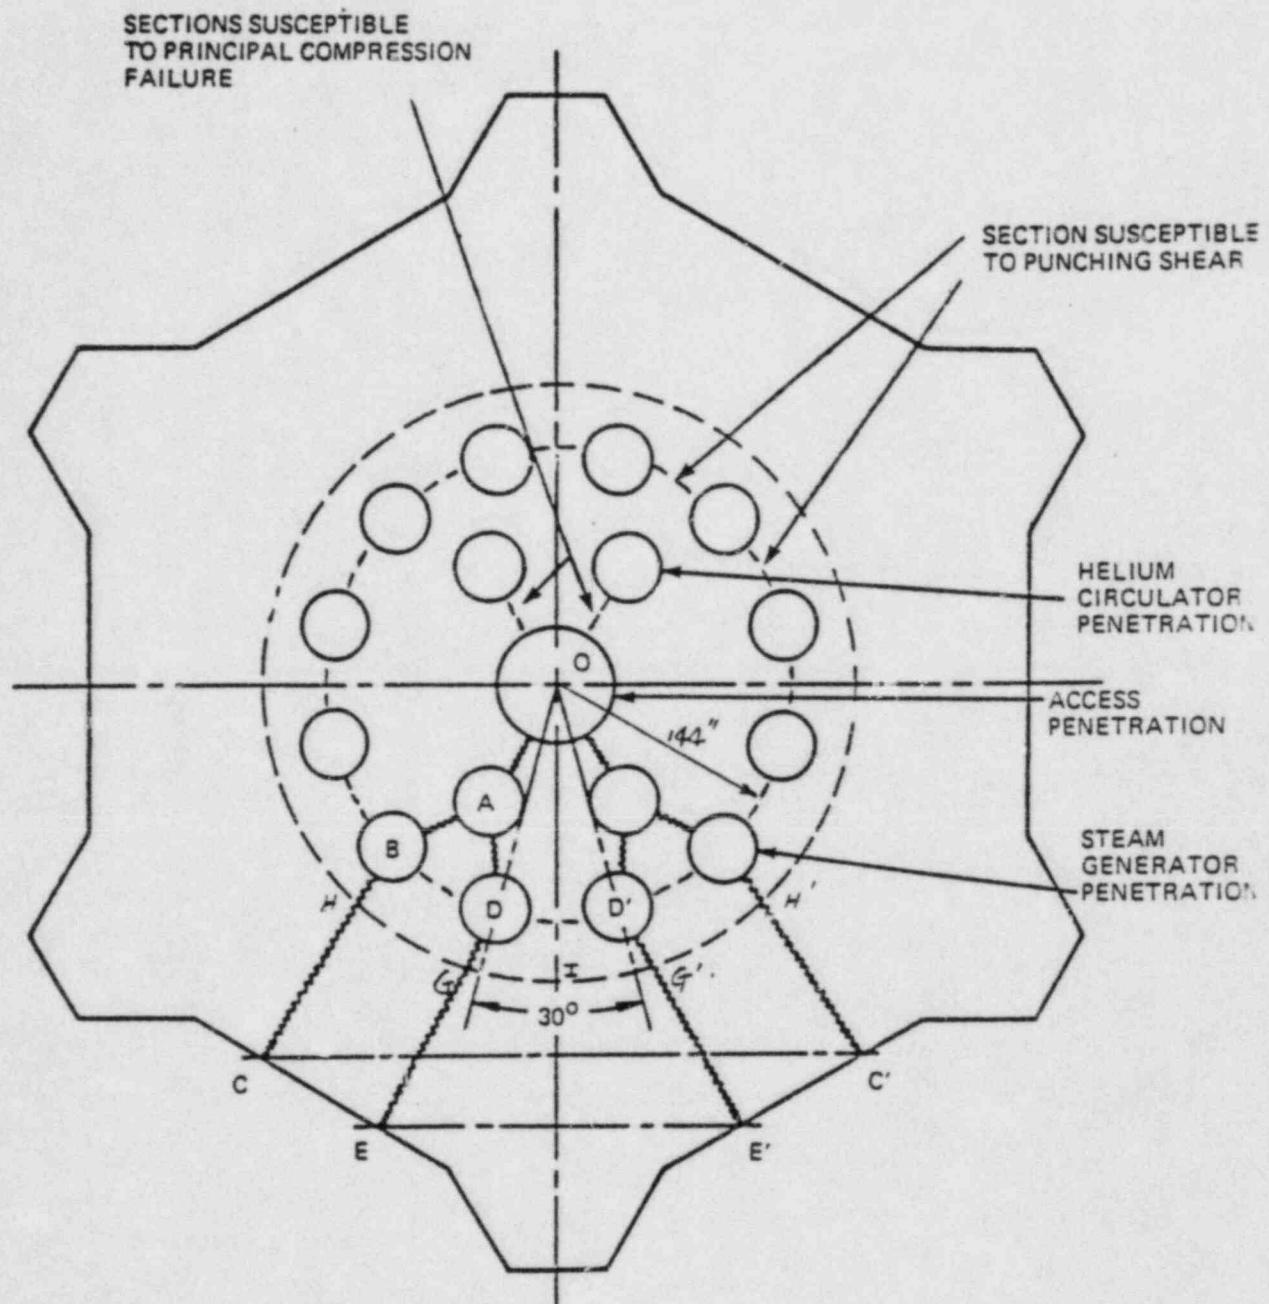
Arrangement of Lower Head Penetrations and Potential Failure Modes
